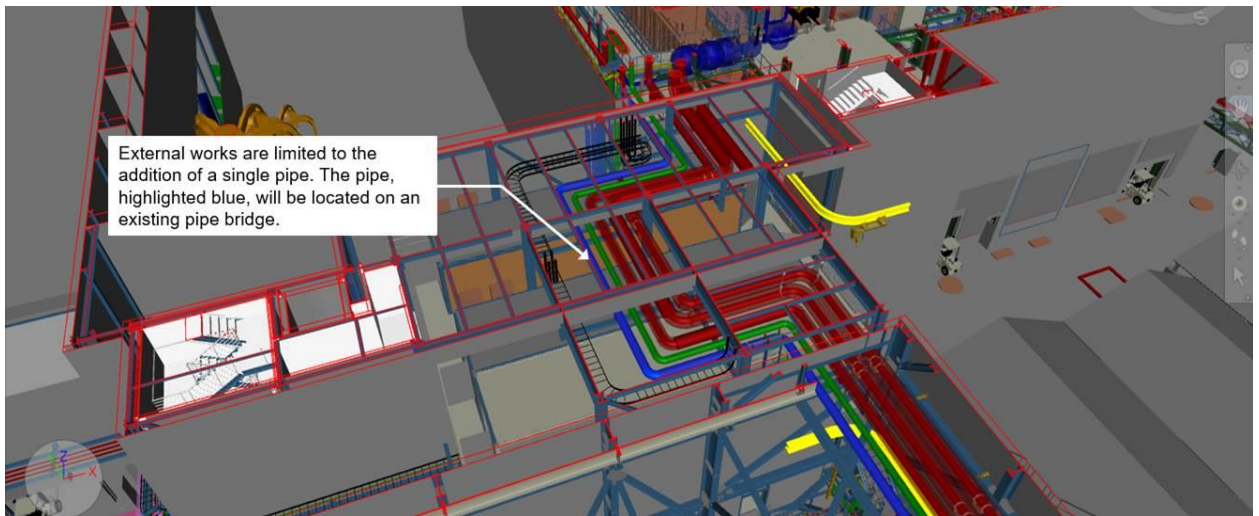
3D Model Close-up Aerial View of Consented Development with external pipework and pipe supports (Note – Proposed Project external pipework is coloured blue)
